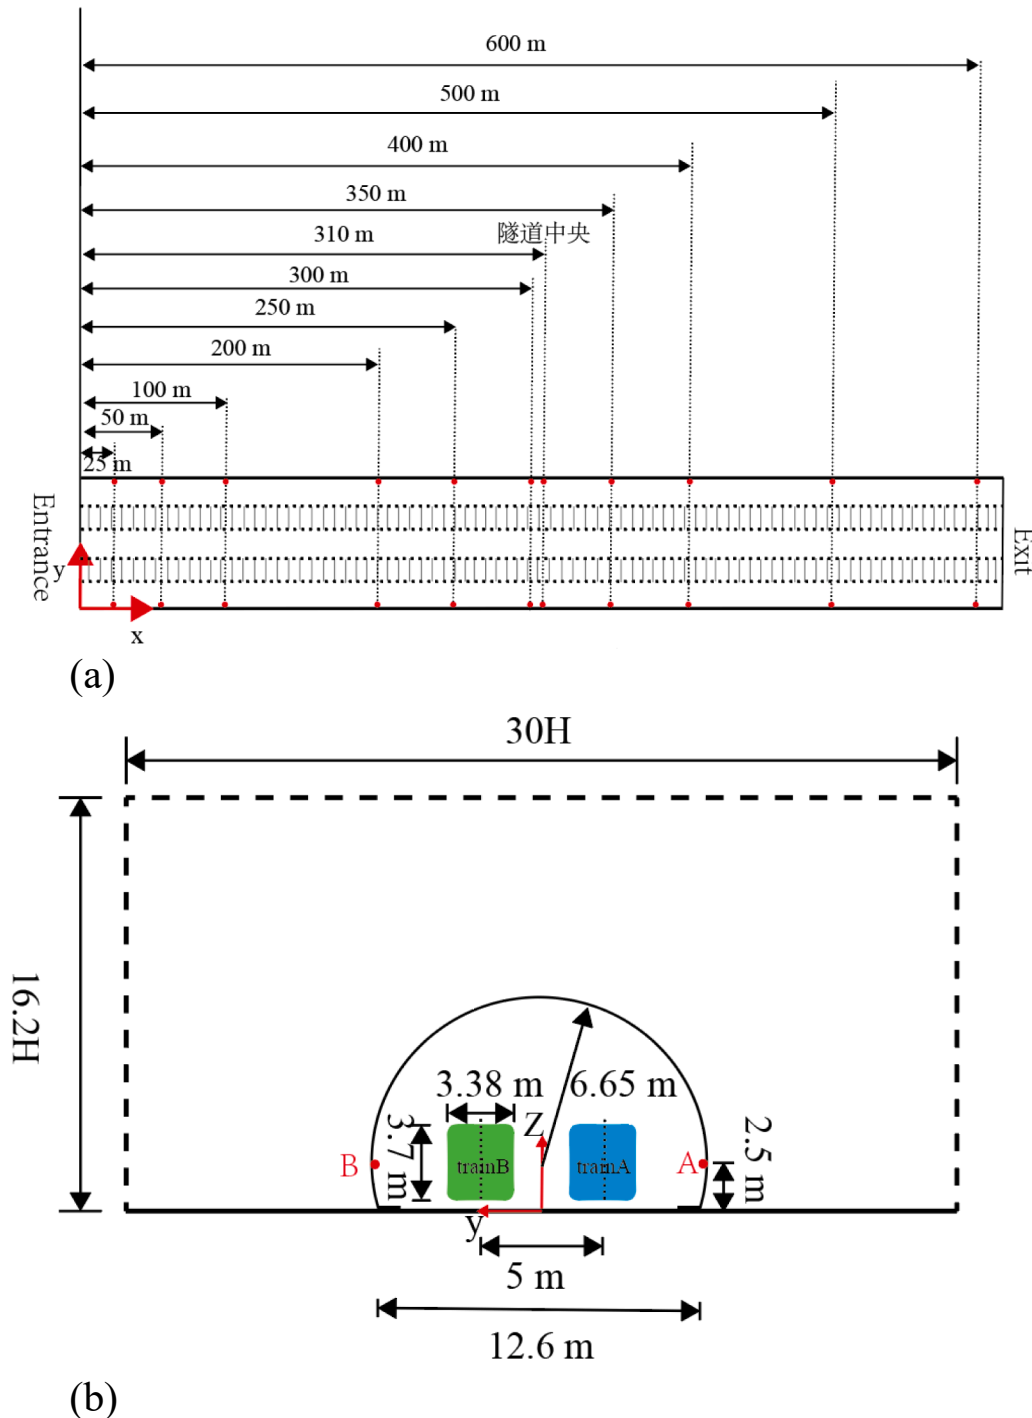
Arrangement of the monitoring points. (a) Layout drawing of monitoring points in longitudinal section of tunnel. (b) Layout of cross-section monitoring points.
